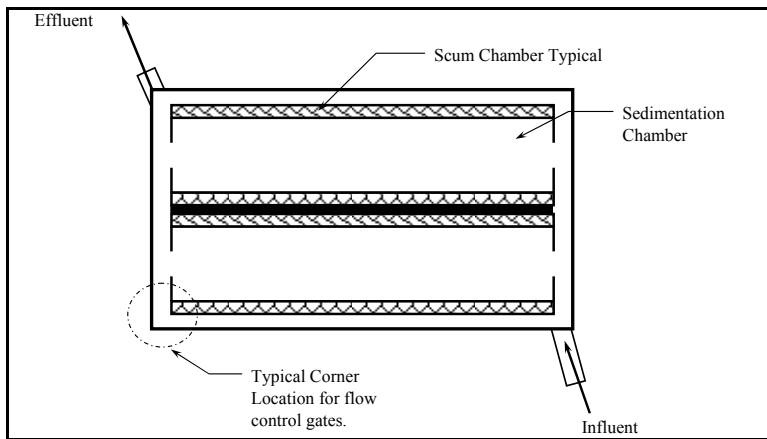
Typical Plan View of Parallel Imhoff Tank System
